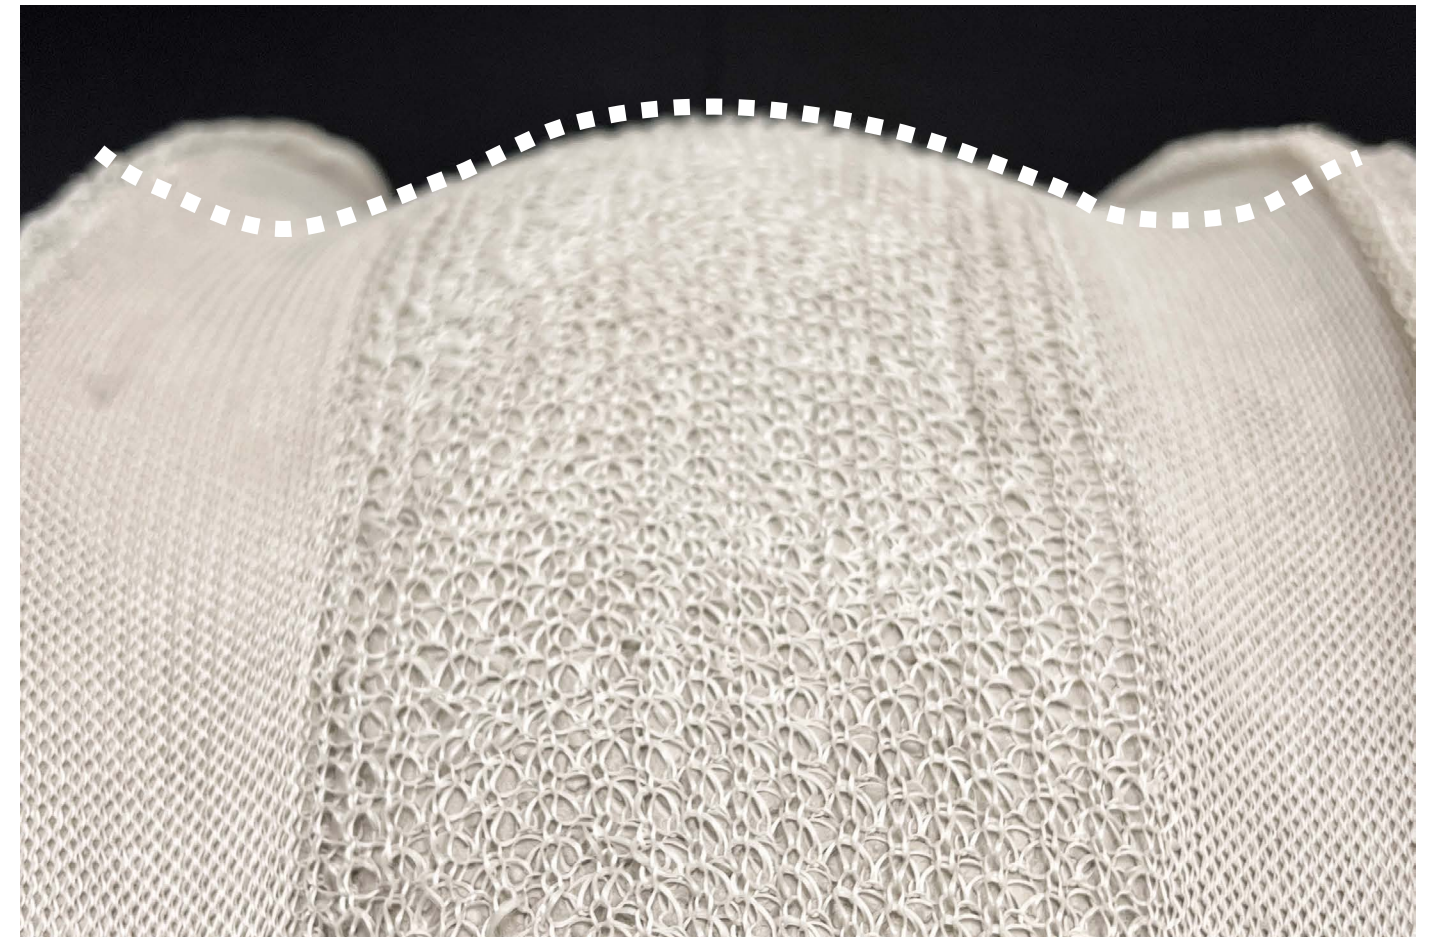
Close-up view of Diamond casting result showing undulating cross section with flared ends.
